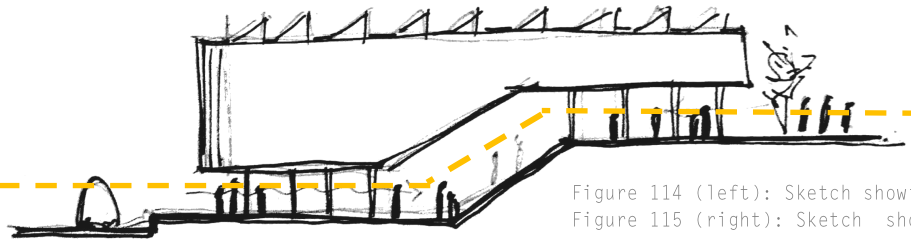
(left): Sketch showing ground floor movement through building, by Author, 2019.
